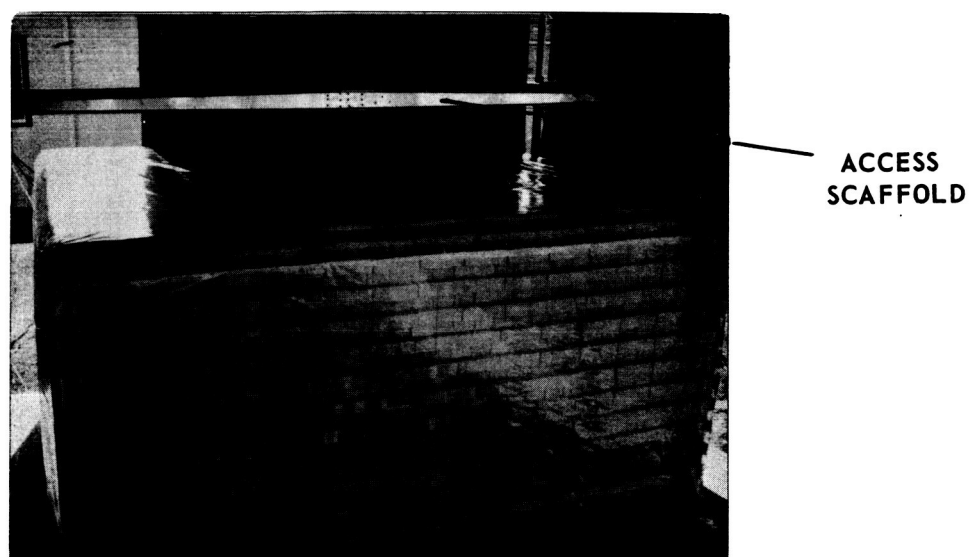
DRY CLAY BRICK ASSEMBLY
